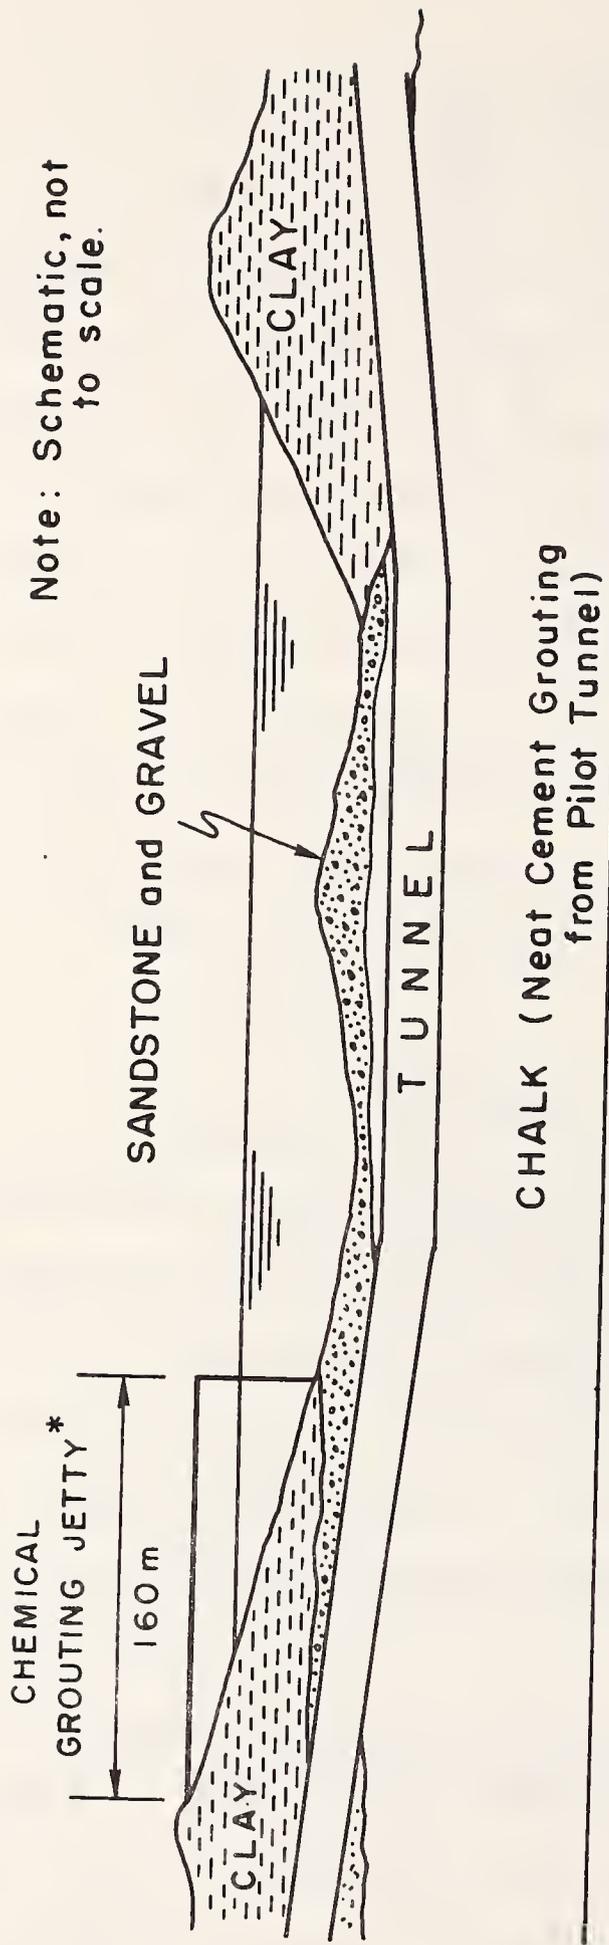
GROUTING TECHNIQUE AND RESULTING GROUTED ZONE, WARRINGTON NEW TOWN SEWER
